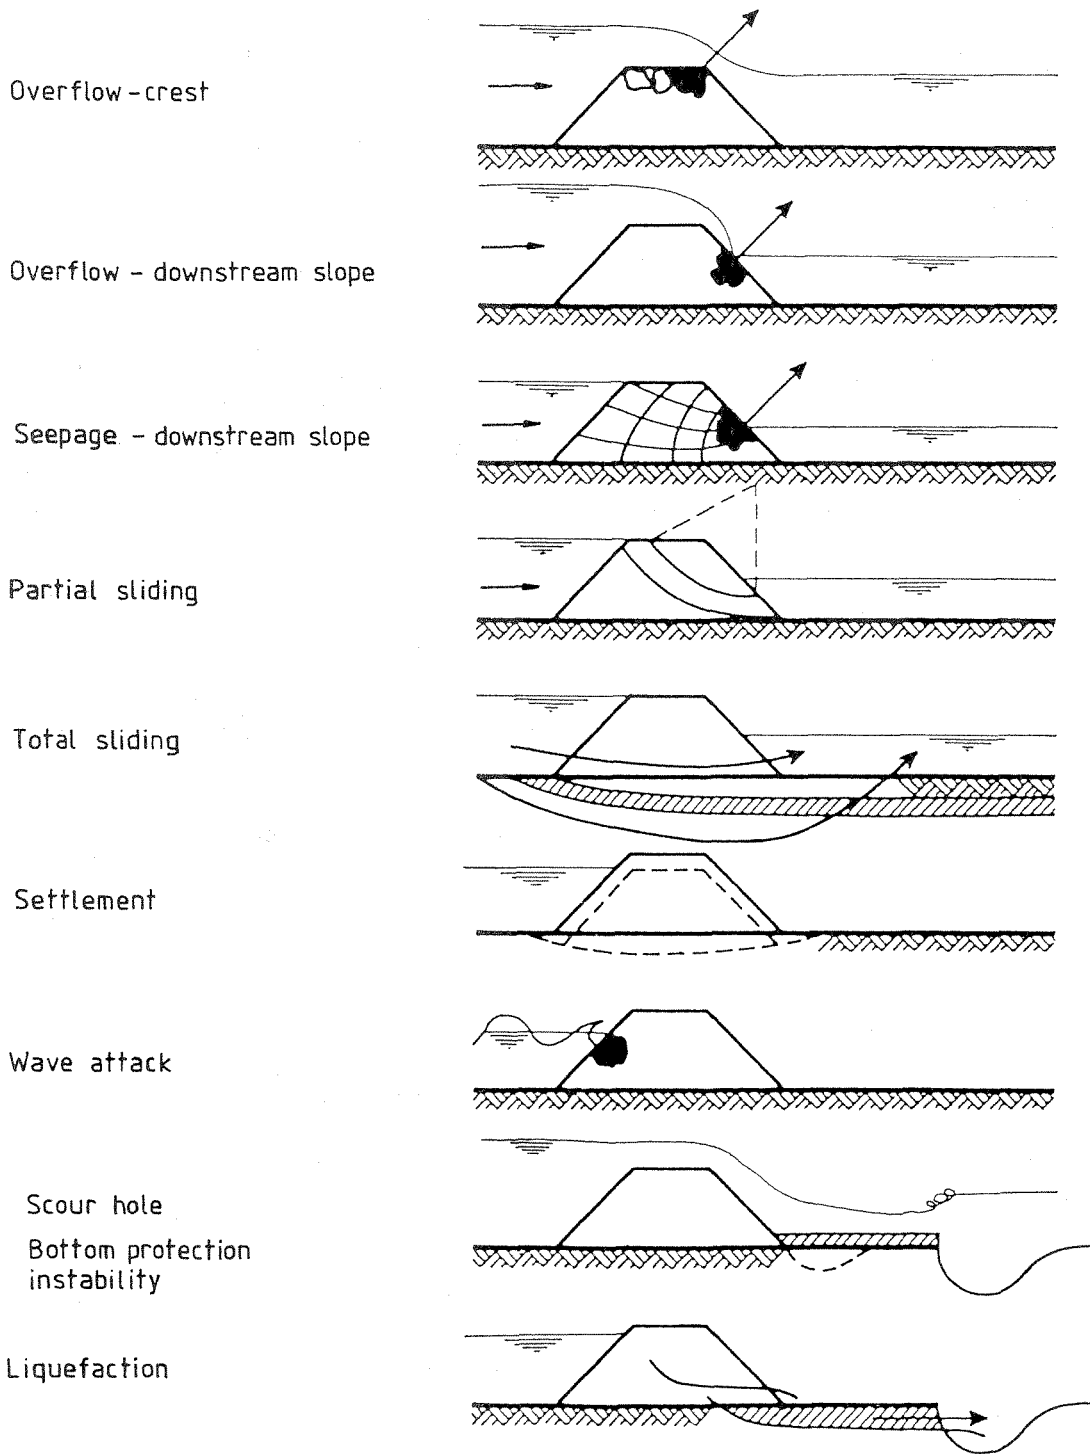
ROCKFILL EMBANKMENT FAILURE MECHANISMS
